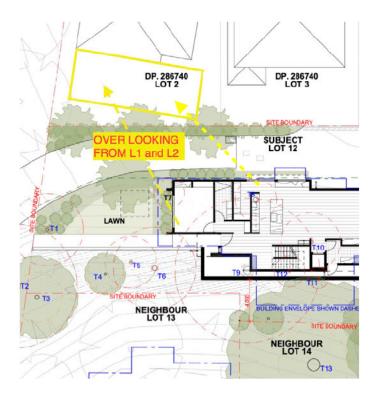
(above). Yellow box indicates major outdoor private open space overlooked by the proposal.
